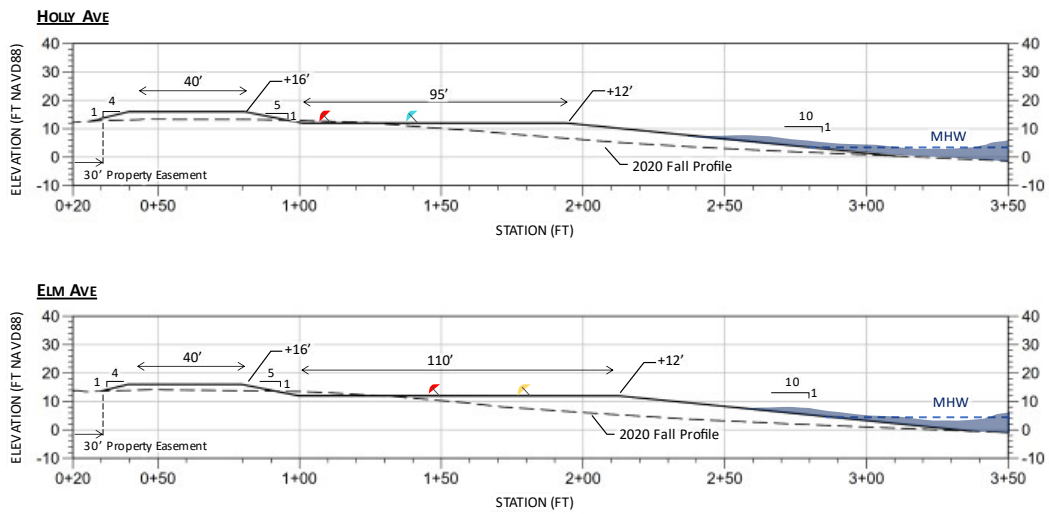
Typical Section of the Concept with a Temporary Pilot Groin With Wider Beach and Single Ridge Dune
